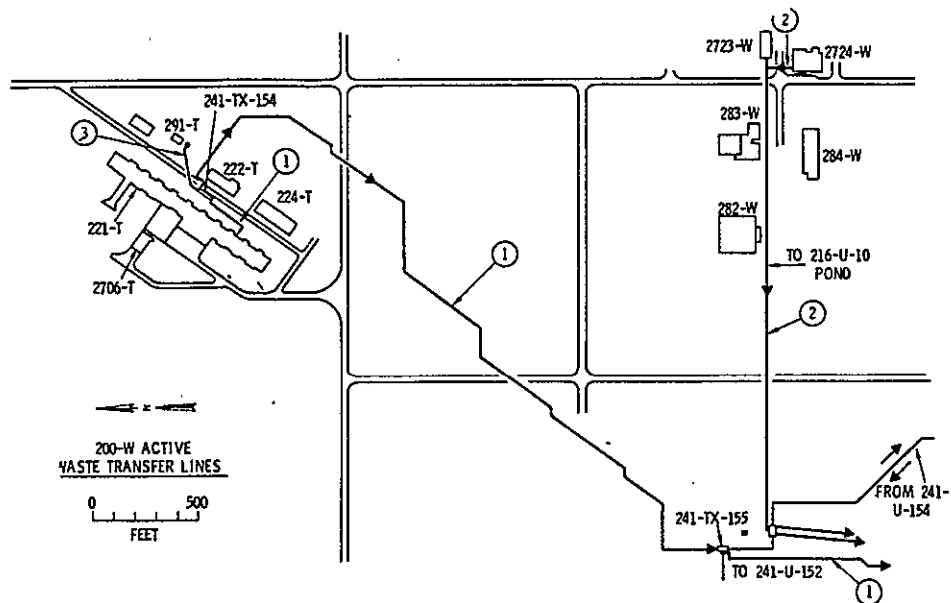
C-29 T PLANT, LAUNDRY AND MASK STATION
